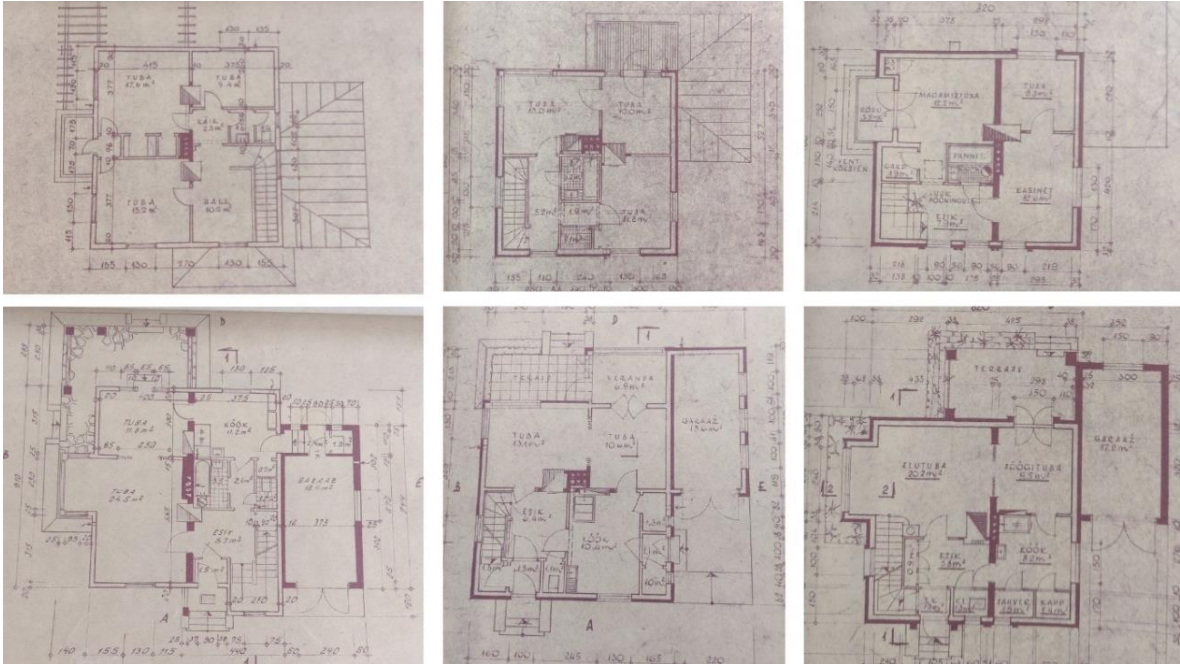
Examples of box house ground floor and upper floor layouts from 1956 (left to right: project 47; project 50; project 52) (RPI Estongiprogorstroi, 1956)
